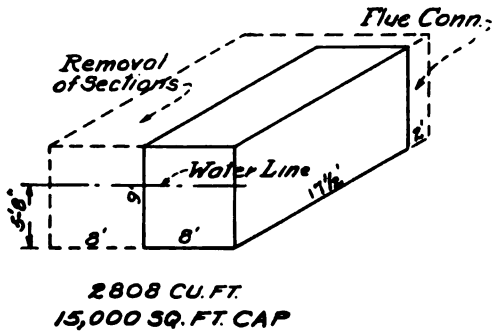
TYPICAL INSTALLATION OF SECTIONAL CAST-IRON BOILER.
